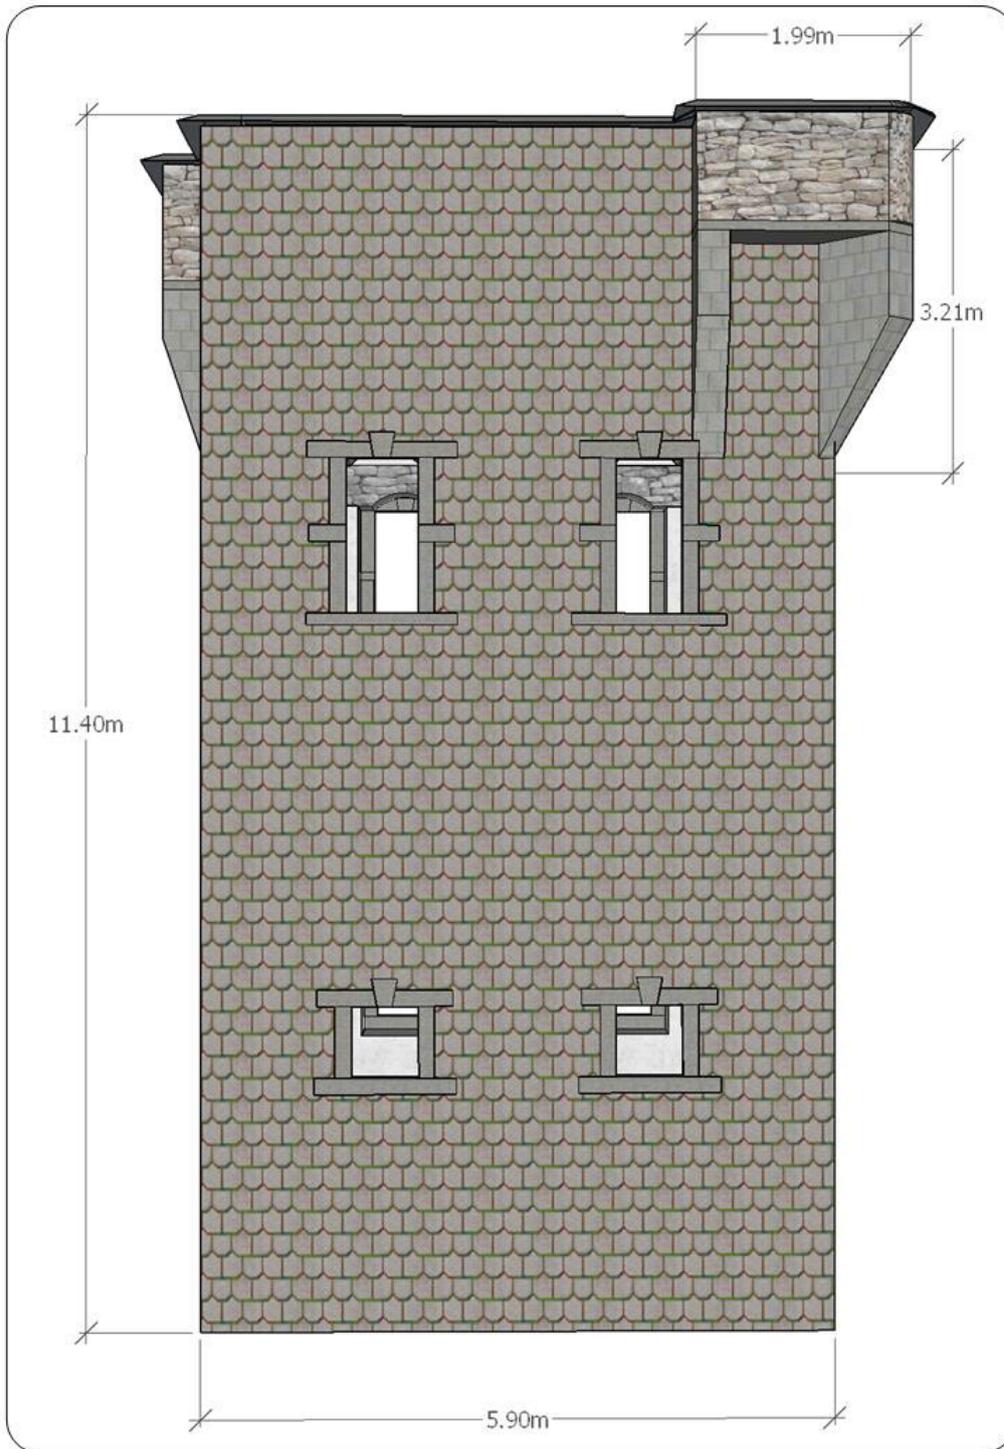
Rendered 3D model for an idealised tower showing side wall elevation with windows and bartizan.
